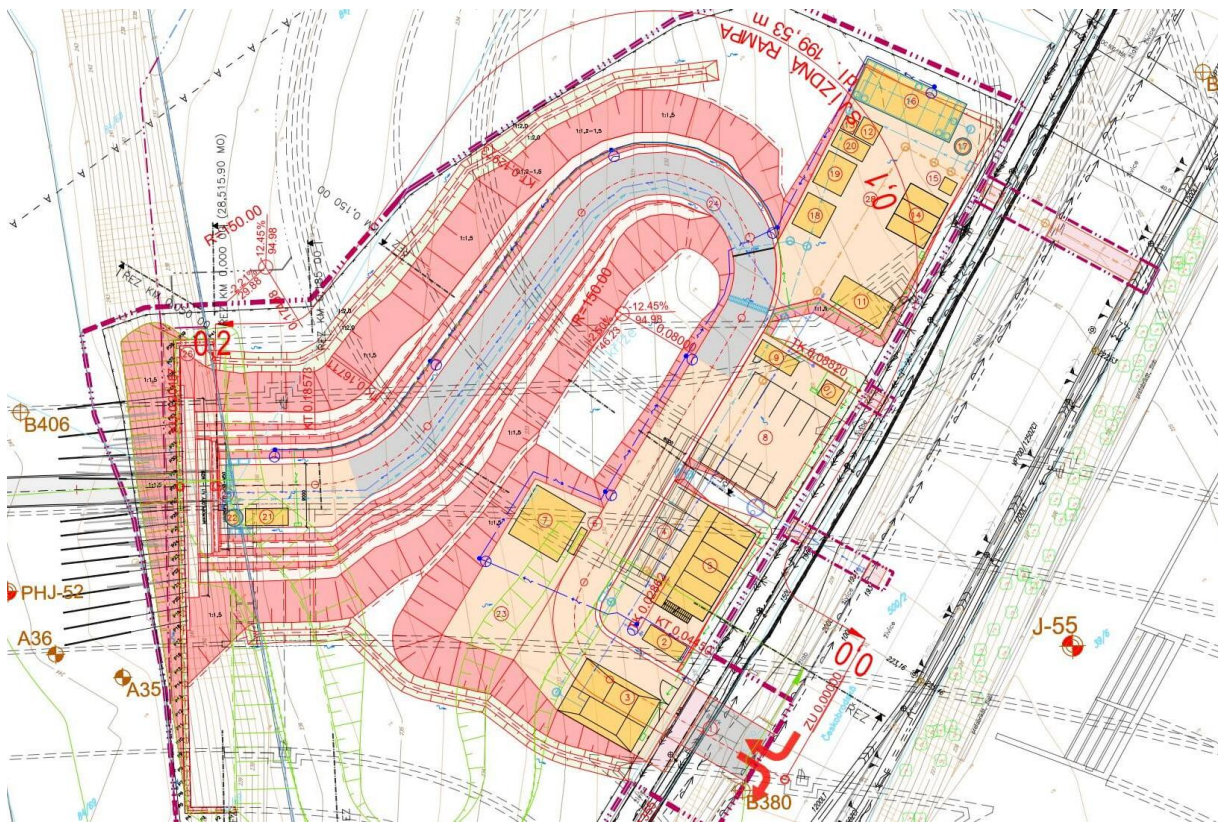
Layout of the access excavation with the excavated portal of the adit and the construction site facilities
